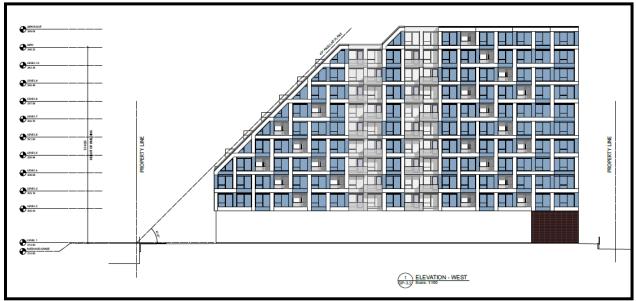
2024 Proposed Development at 6179 Lundy's Lane - West Elevation (CY Lee Architects Inc. 2024a)
